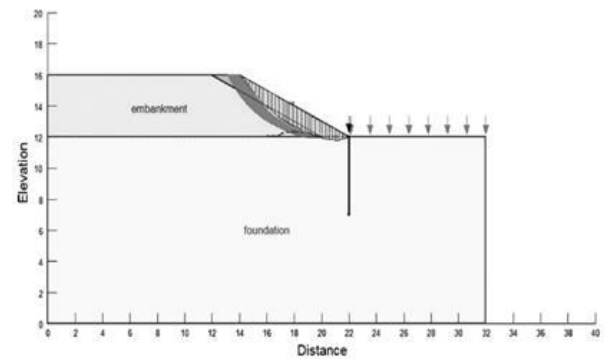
Critical slip surface within the embankment with rockfill berm and sheet piling in place
